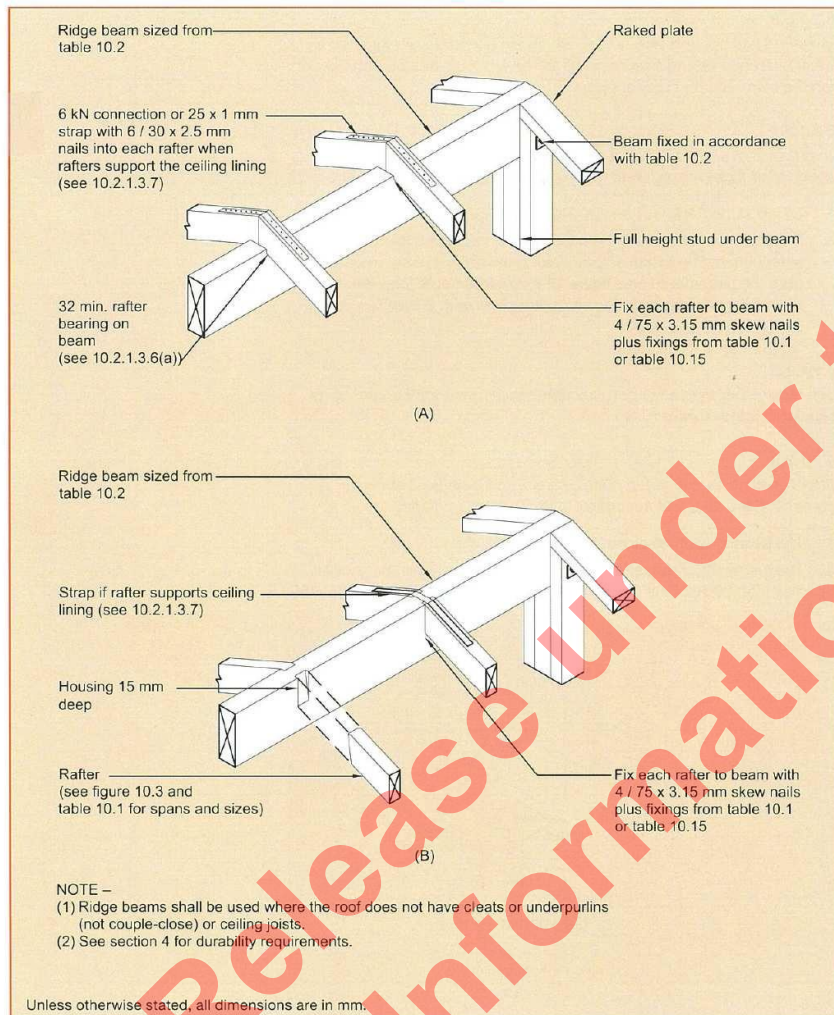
Rafter to ridge beam connections (see 10.2.1.3.6)
